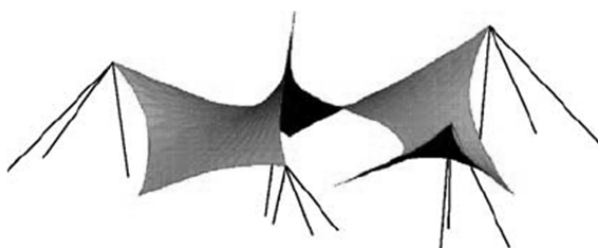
Cable reinforced tent Hüfingen tensioned fabric structure model
